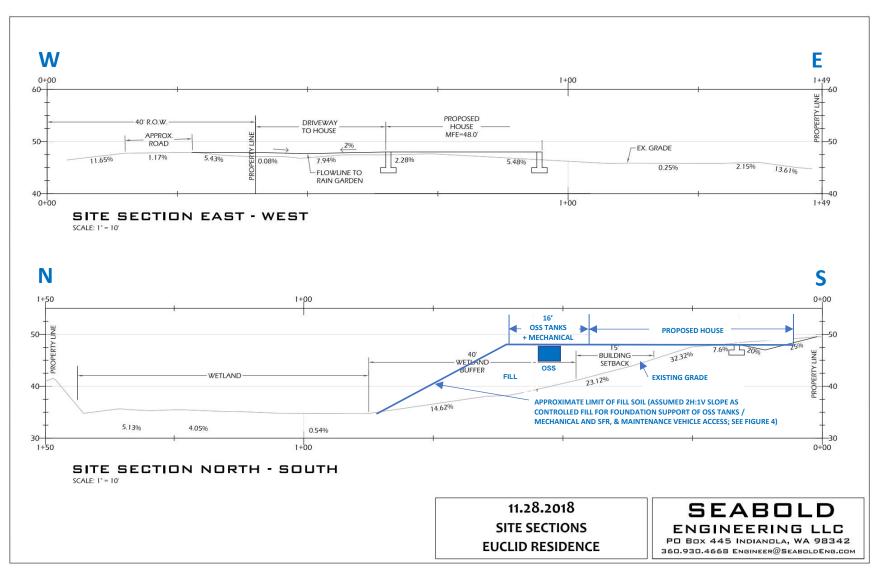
CROSS SECTIONS OF SITE DEVELOPMENT AS RECOMMENDED IN NOCA
